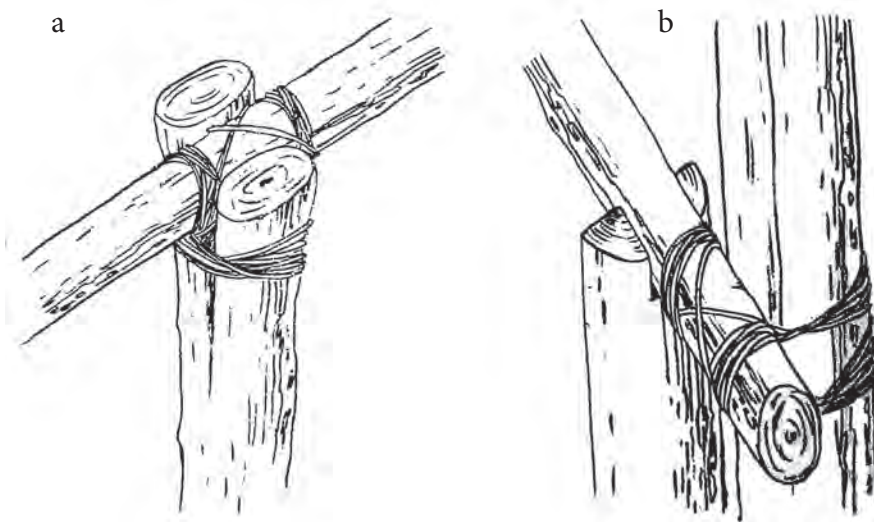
The twin-pile building technique: long (a) and short (b) piles supporting the roof (from Menotti 2012, 137, Fig. 4.7).
